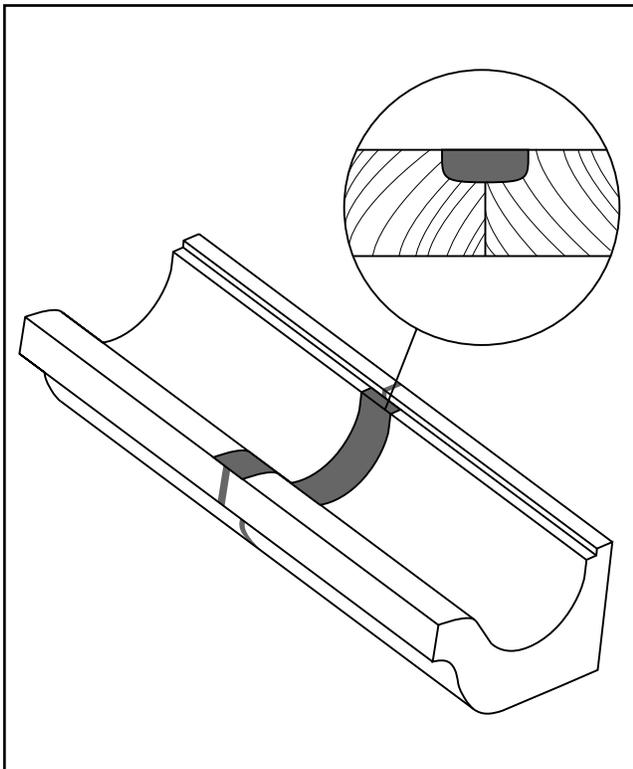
Gutter Joint Detail Using Urethane Caulk Web
